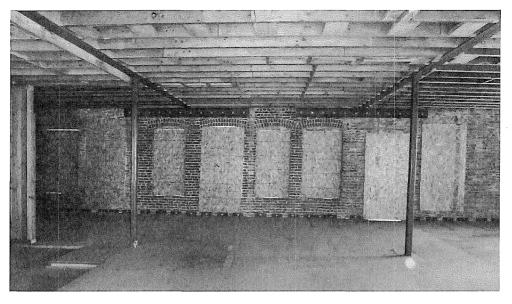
Photograph of typical west interior elevation. Note window openings covered with plywood at interior (photograph taken on 02/27/2018).
